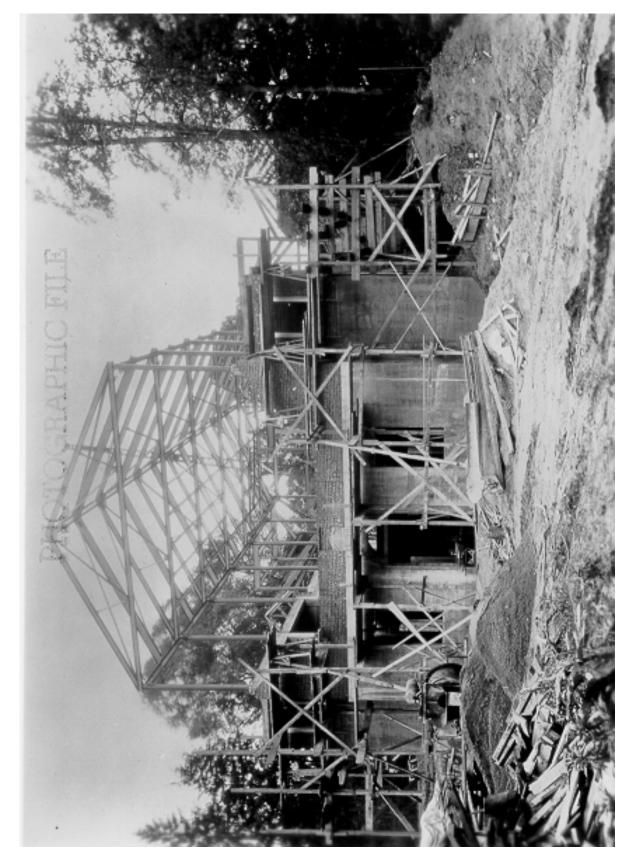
Morristown Museum Building: north elevation, poured-concrete foundation and steel framing (June 1936).
